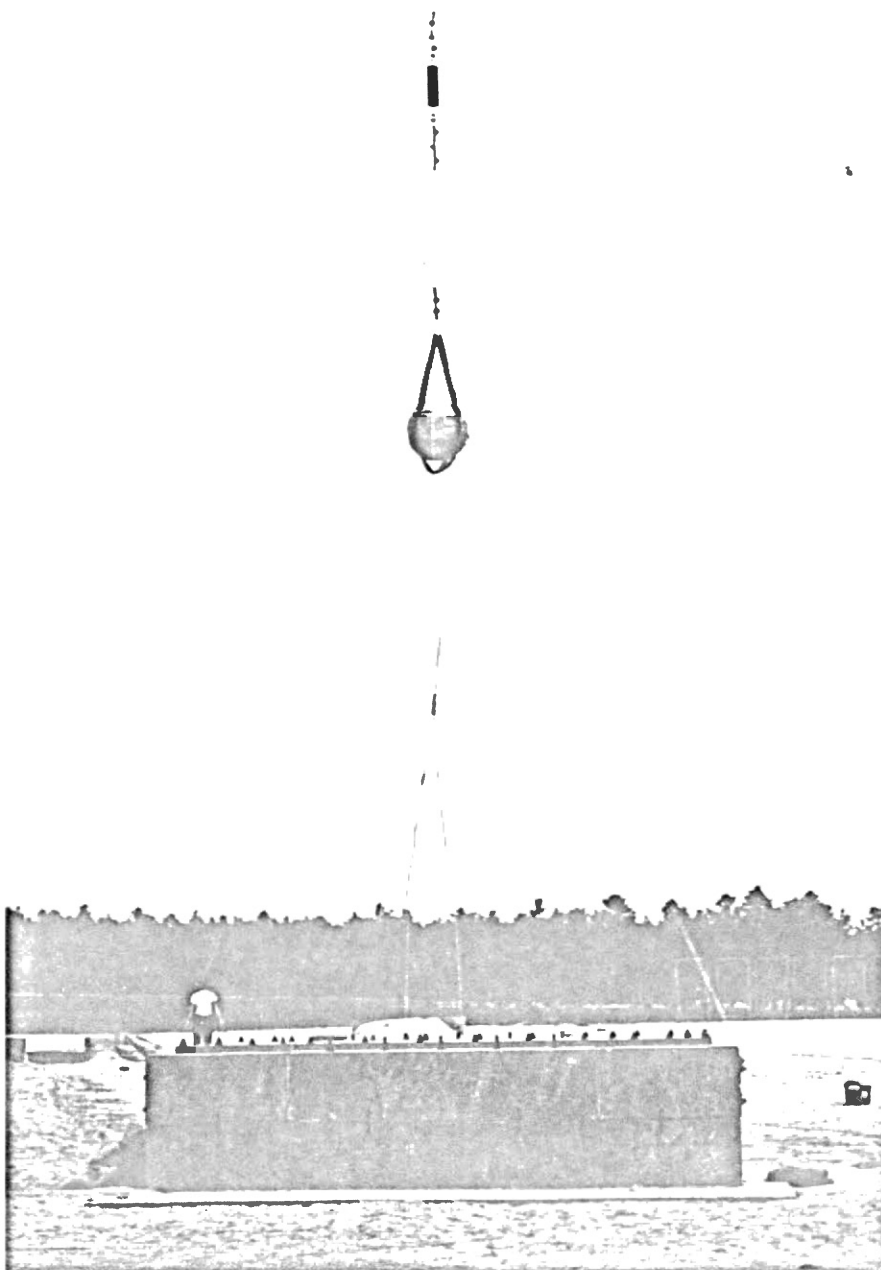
Charge in Place Over Test Fixture Prior to Test.
